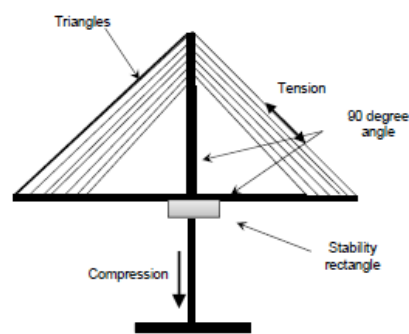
A simple illustration of the typical cable-stayed bridge (O.Zadeh, 2012).
